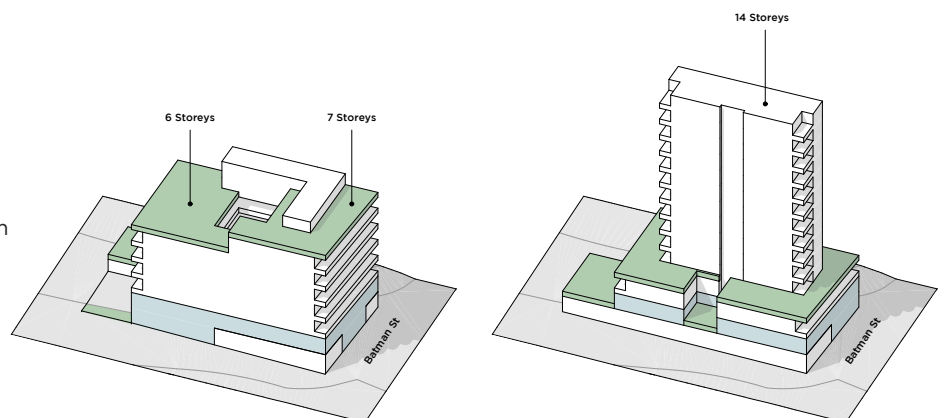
Built form testing to show the proposed floor area ratio and built form controls on a mid-block site in Flagstaff (DDO33). Images are indicative only to test the proposed controls and are not representative of actual building proposals (*West Melbourne Built Form Testing*, Breathe Architecture).
